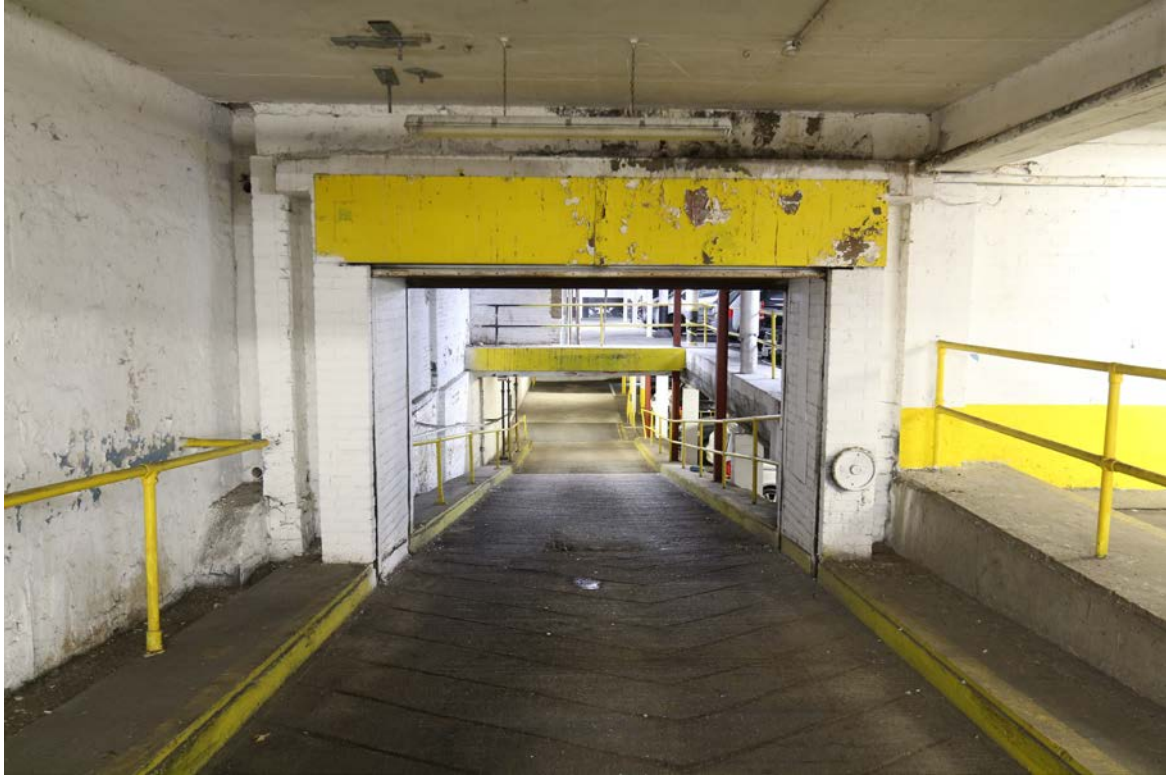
Ramp from first floor level down to upper ground floor level, looking east
